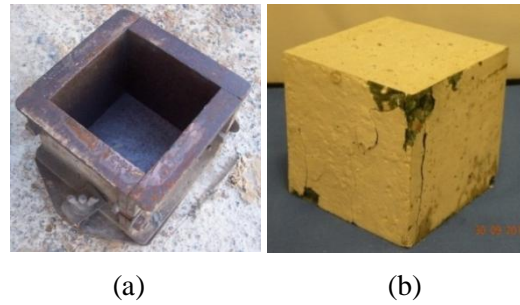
(a) Steel moulds for cube specimens; (b) Cube specimen after crushing
